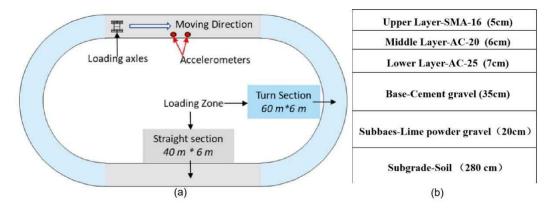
(a) Layout of the full-scale Accelerated Loading Test; (b) Pavement structure and materials
